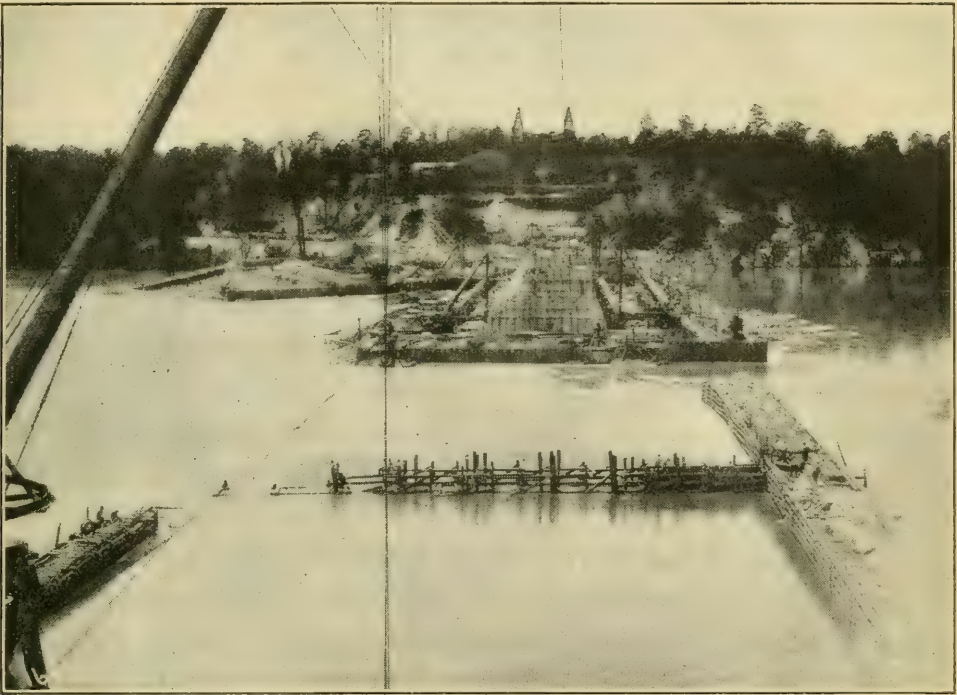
SECOND COFFER-DAM, SHOWING CONSTRUCTION OF LIGHT PARTITION RIBS UNDER WAY.
